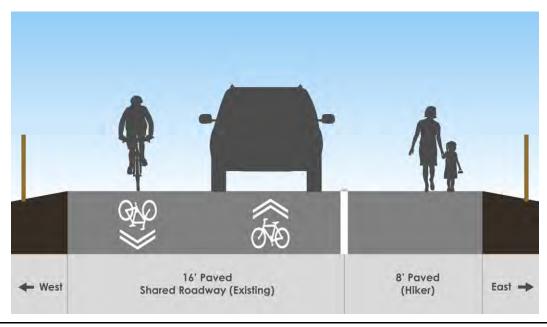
Segment 1 Paved Multiuse Trail Alternative
